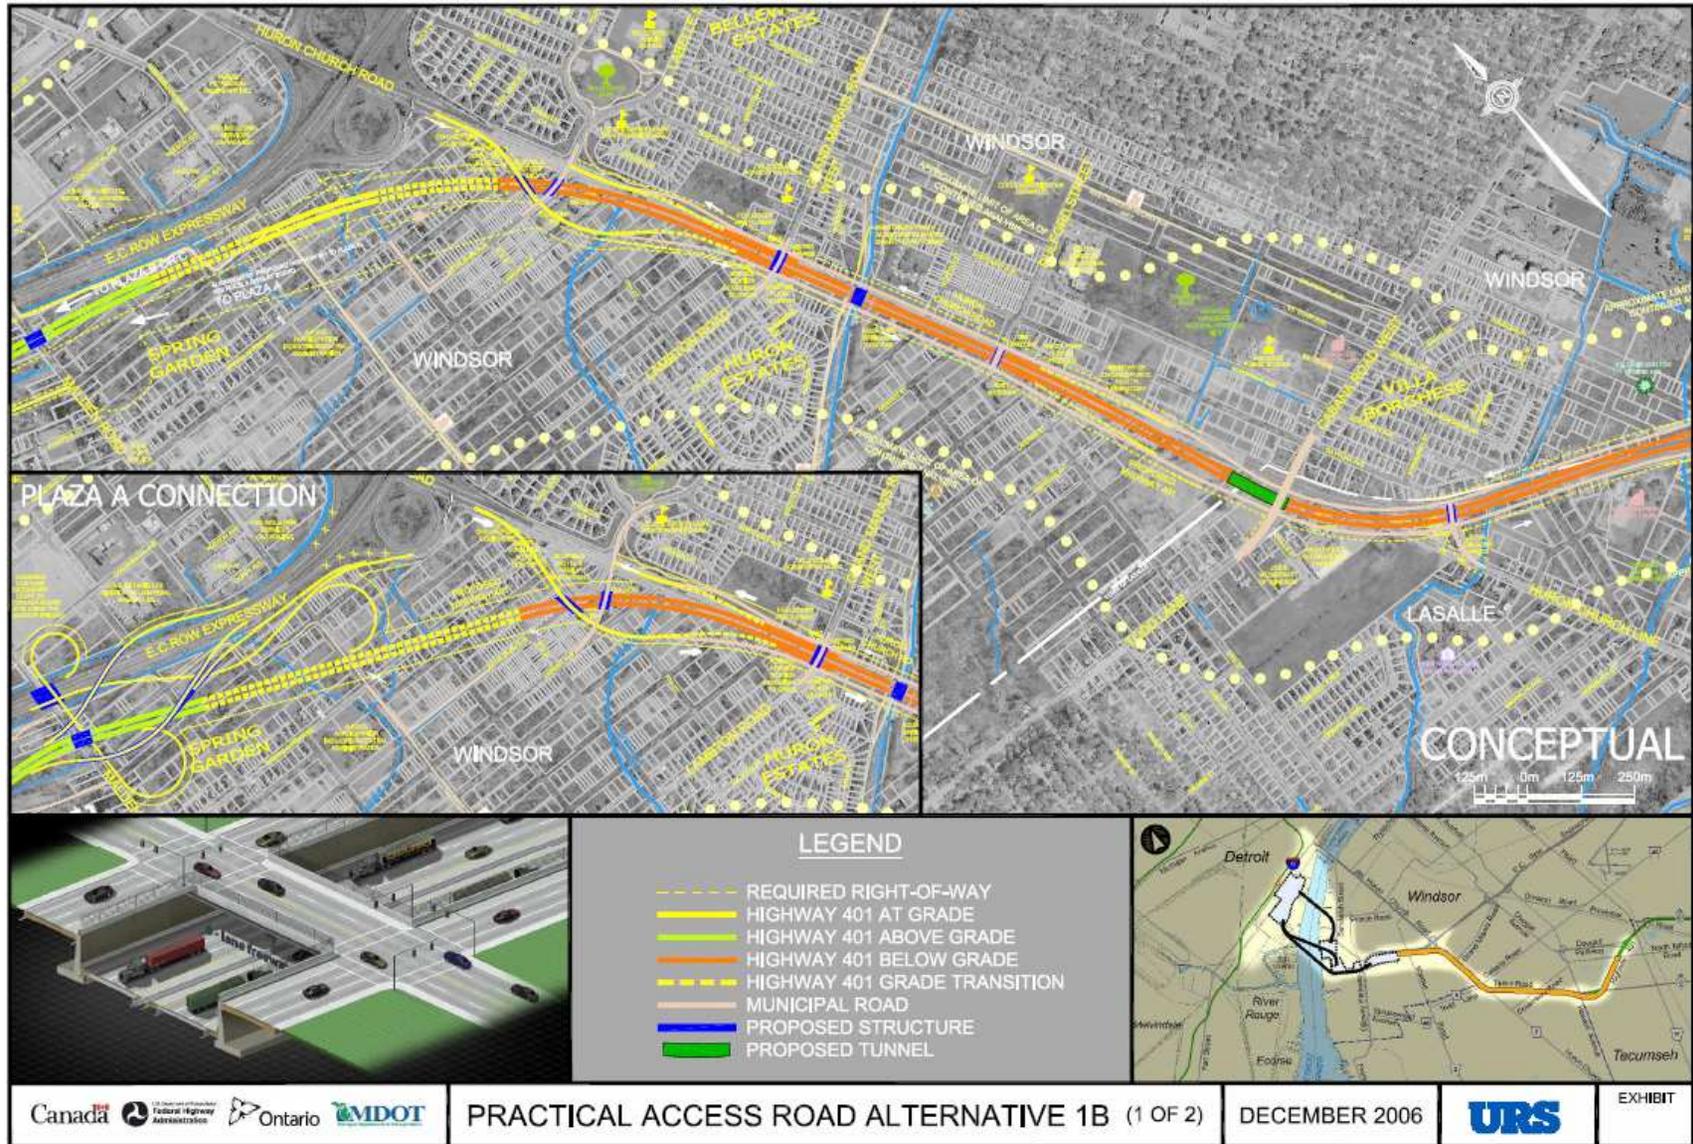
PRACTICAL ACCESS ROAD ALTERNATIVE 1B
